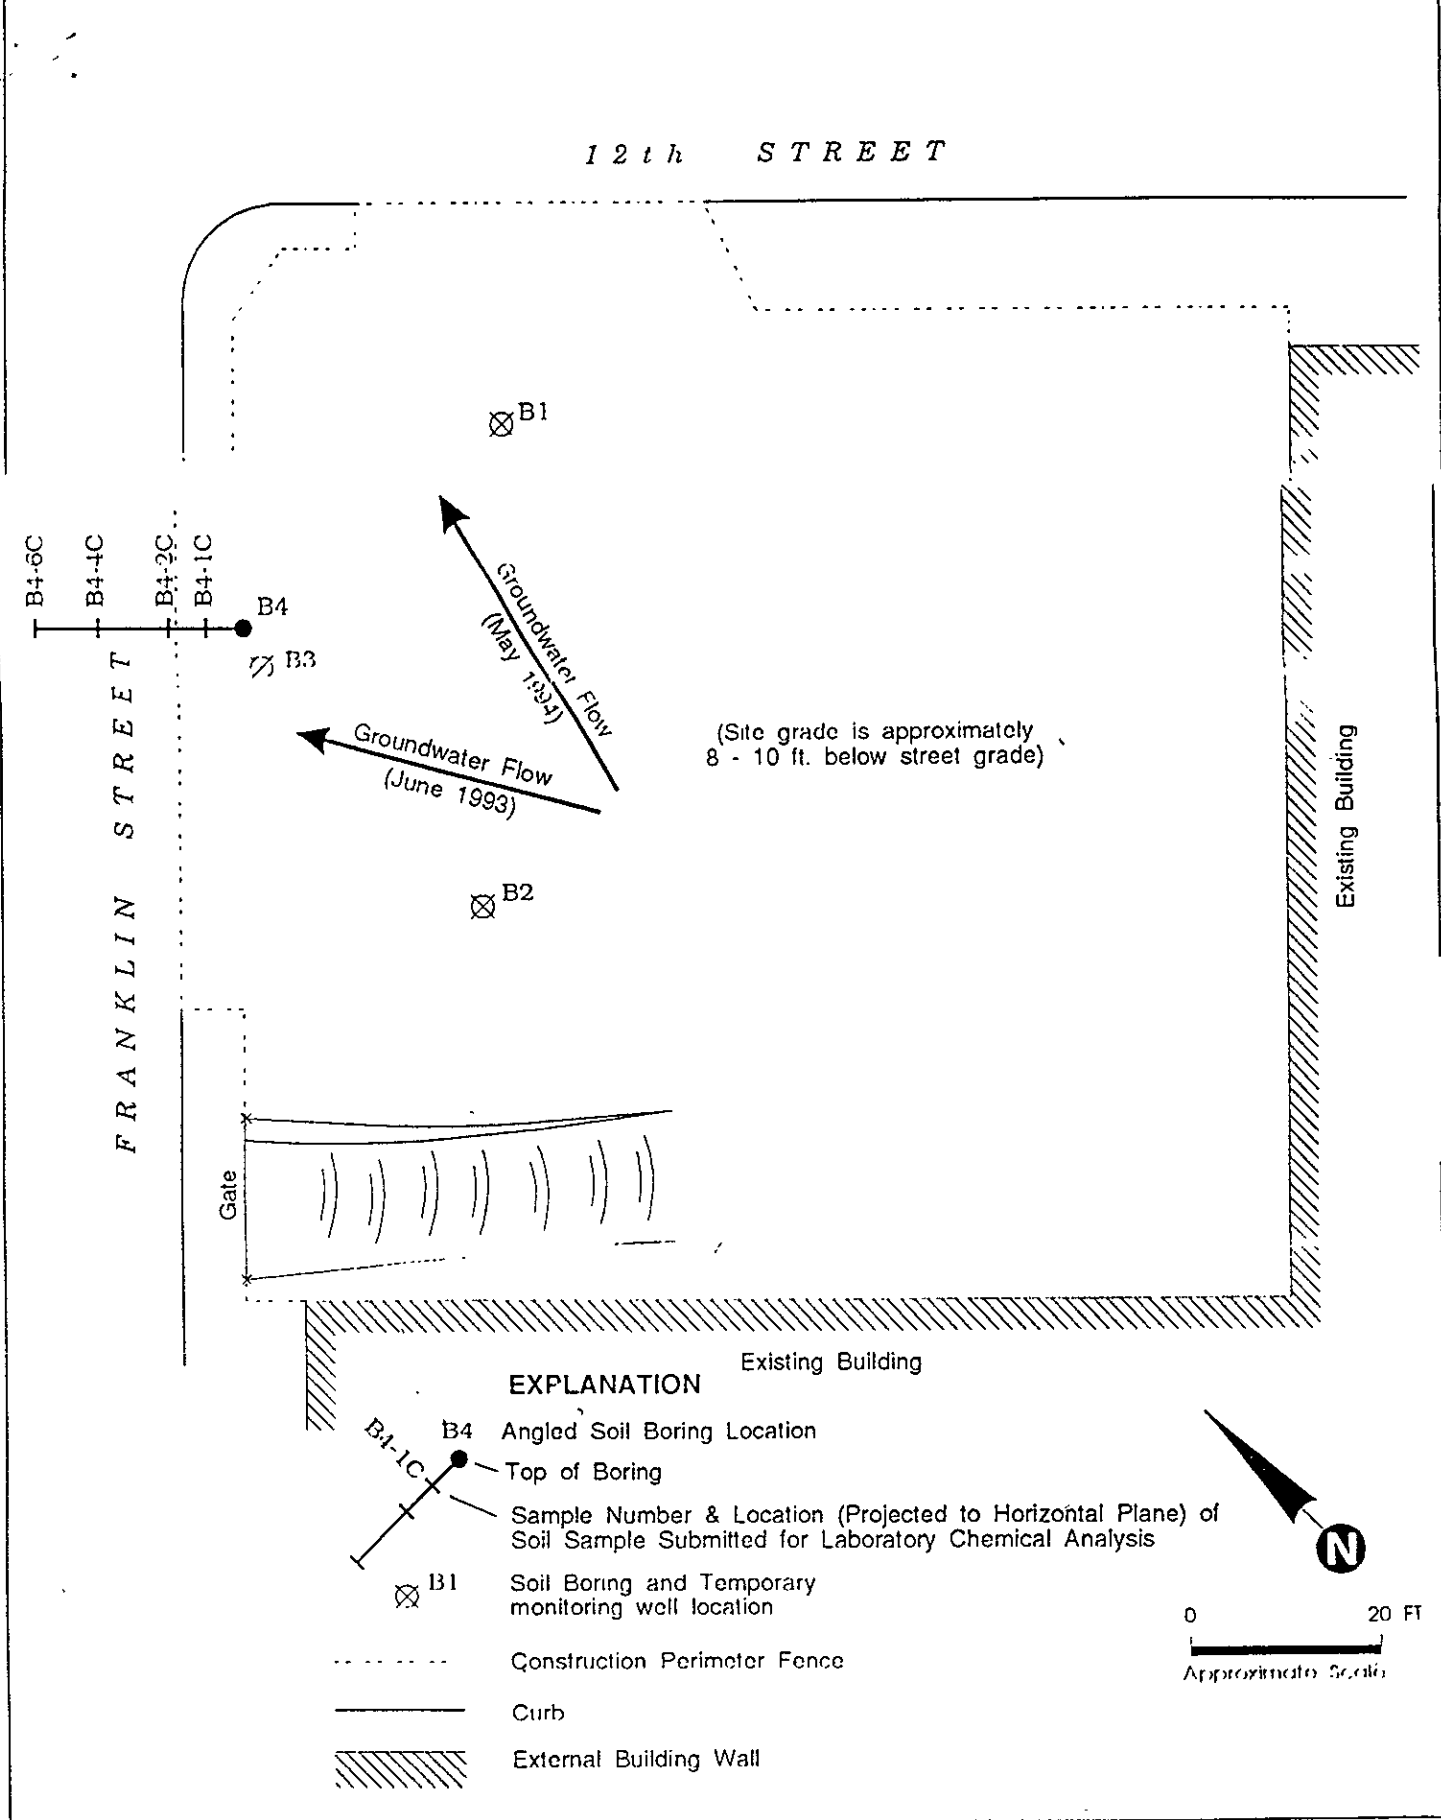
SITE PLAN SHOWING GROUNDWATER FLOW DIRECTION AND RECENT SOIL SAMPLING LOCATIONS
